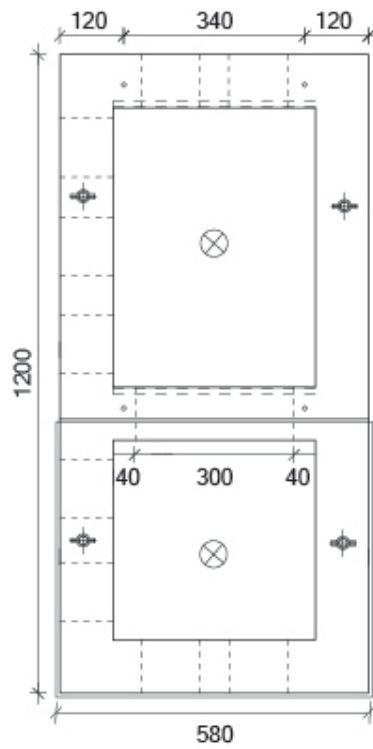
Indicative drawing for double cabinet's concrete foundation, top view (mm)
